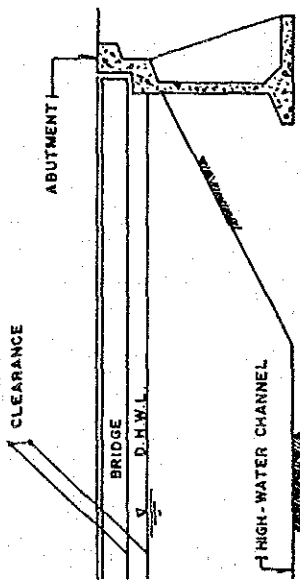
TYPICAL CROSS SECTIONS OF EXISTING DIKE (4/4)
